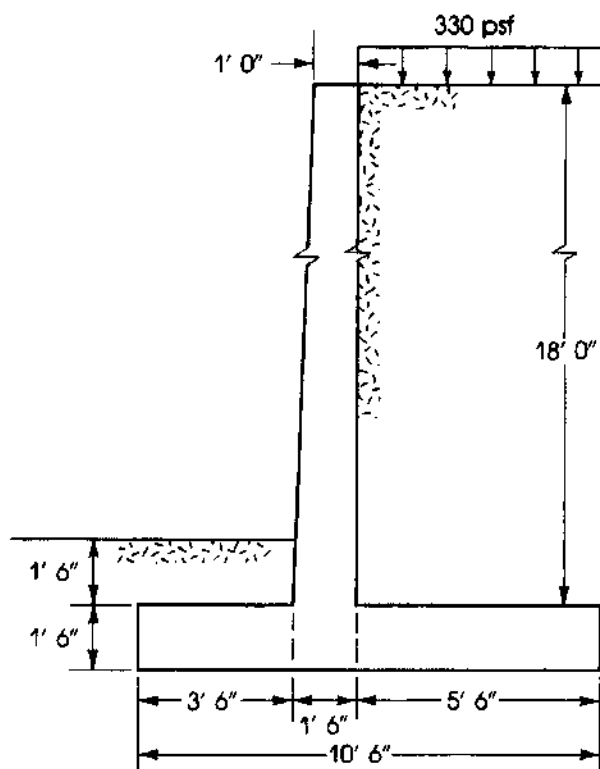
Example 14.2: trial configuration of retaining wall.
